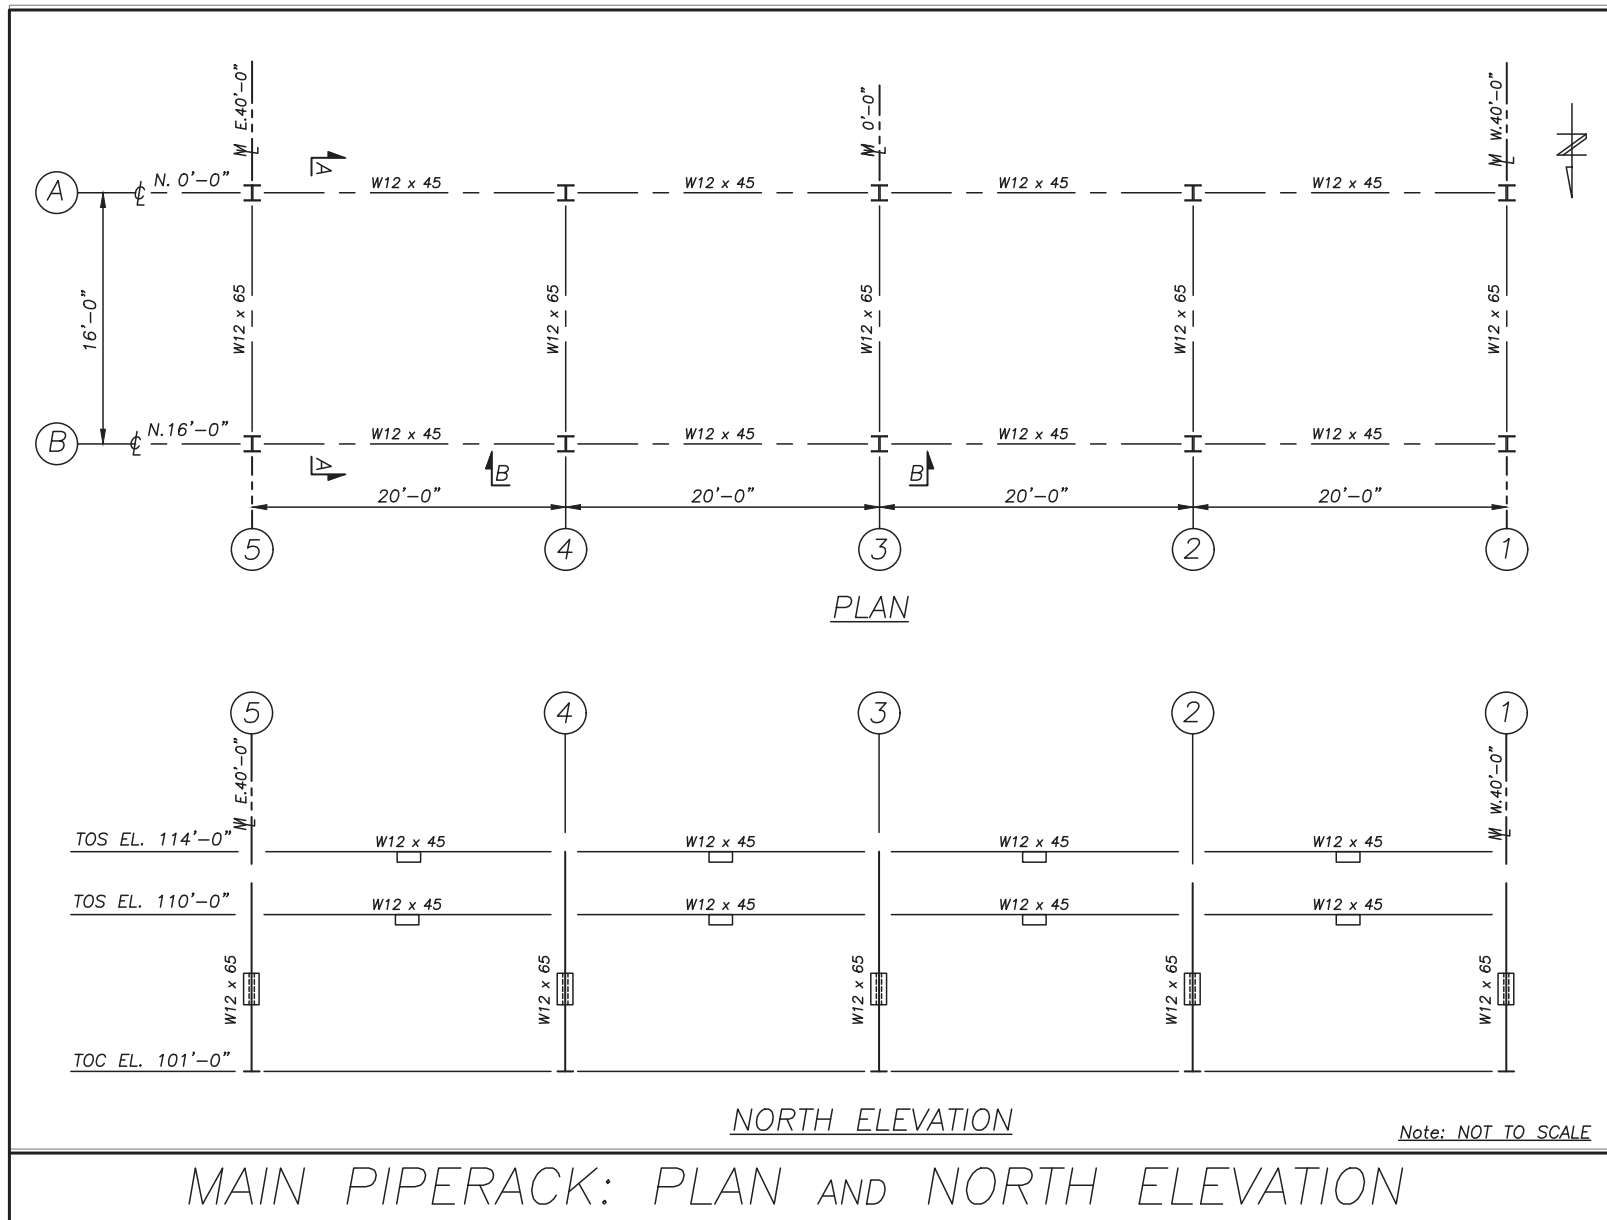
Main Pipe rack: Plan and North elevation drawing.
